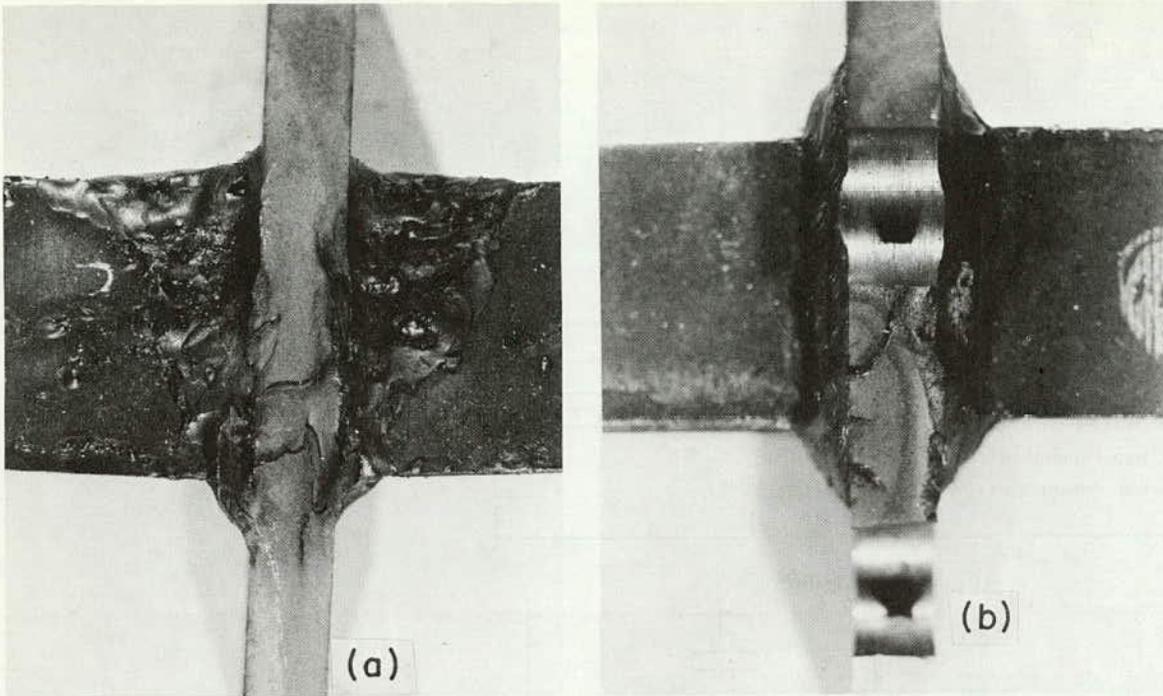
(a) Crack growth from ends of groove-welded attachments to web surface; (b) crack growth from ends of fillet-welded attachments to web surface.
